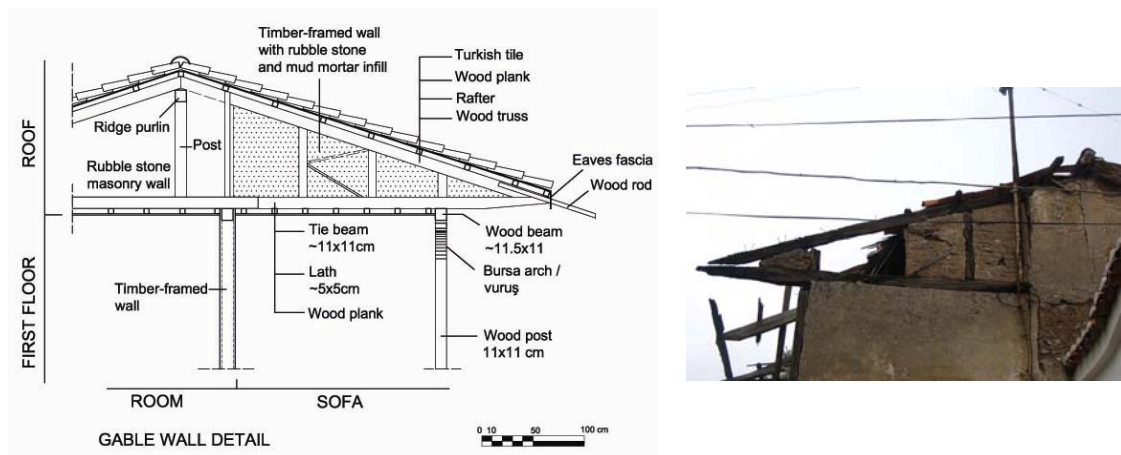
Detail of gable wall in pitched roof (Camcı St. 2nd dead end No: 34)
